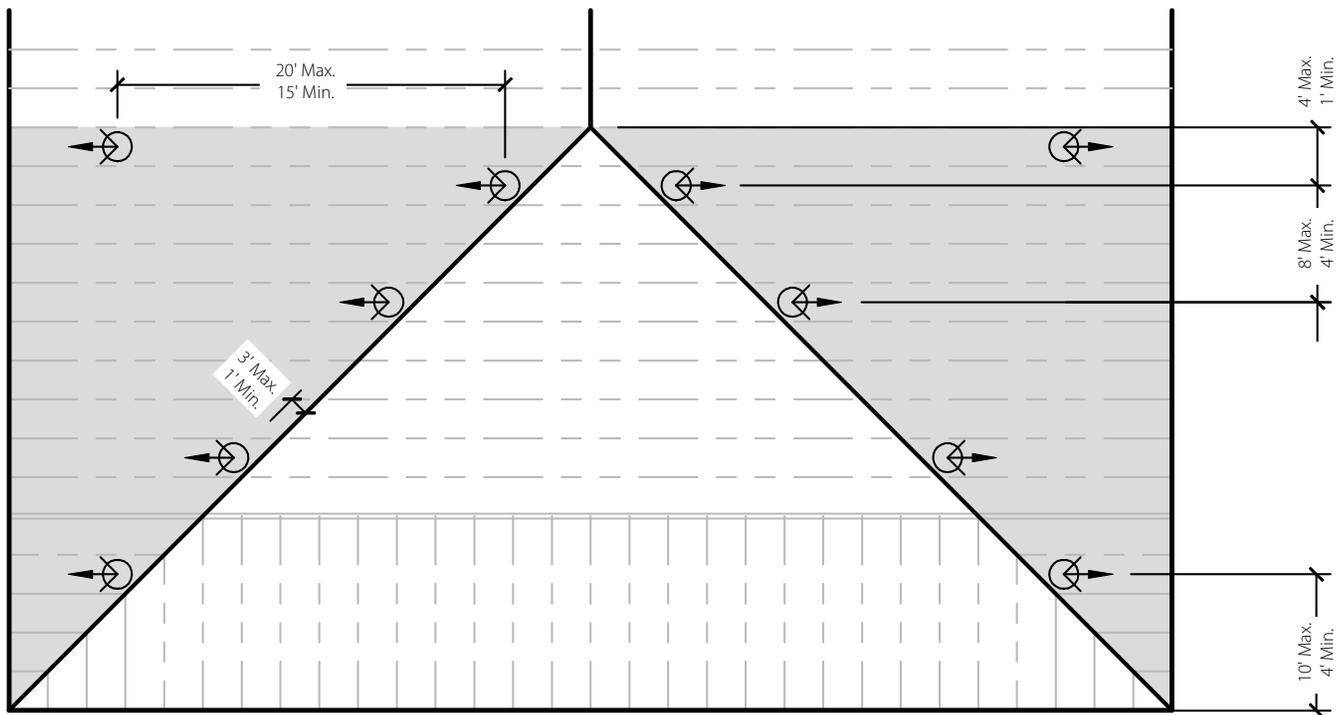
ADJACENT HIP LAYOUT CRITERIA USING FL-SA/DS SPRINKLERS
